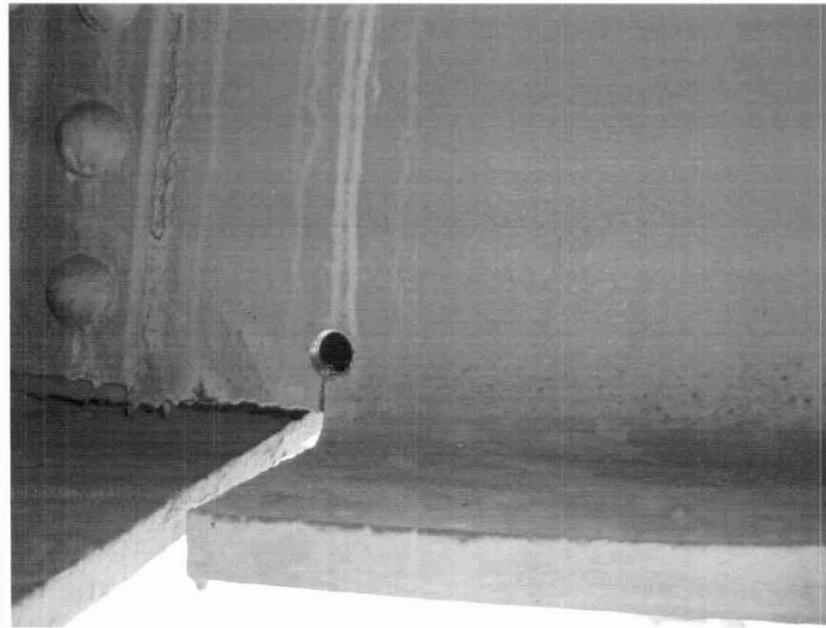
Crack in web of girder 2 of span 1 at cope, stop hole in place.
